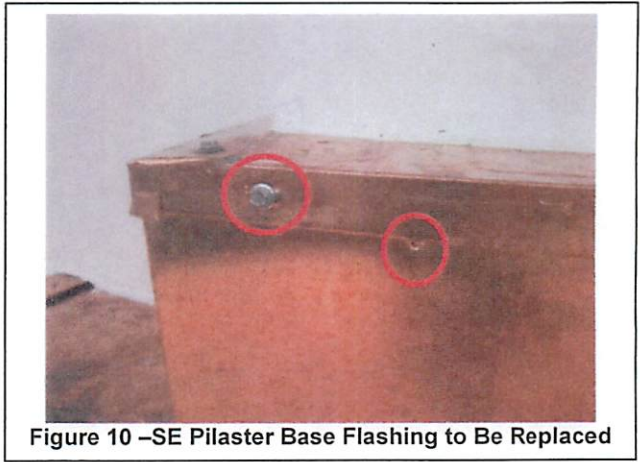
SE Pilaster Base Flashing to Be Replaced
